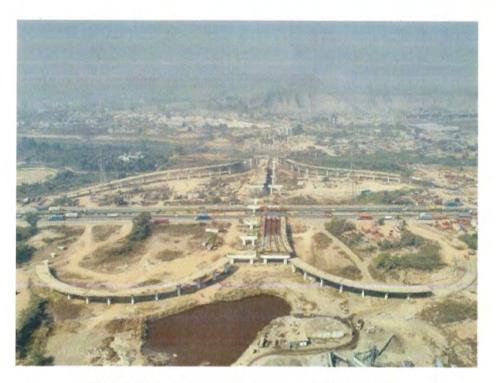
A view of MTHL Bridge at Chirle Interchange
